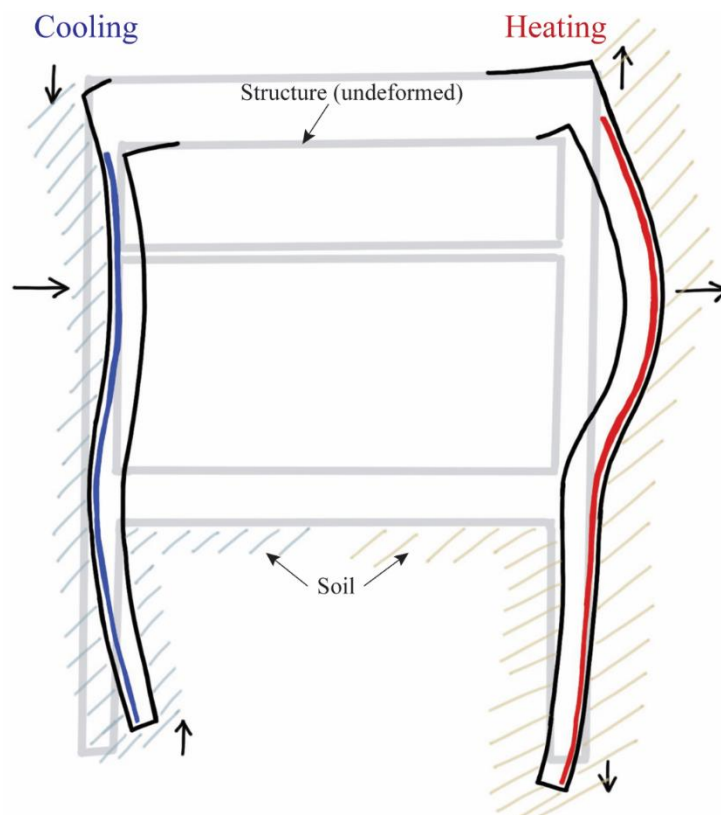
Sketch of the vertical deformed shape at a vertical cross section. NOTE: the figure is not scaled
